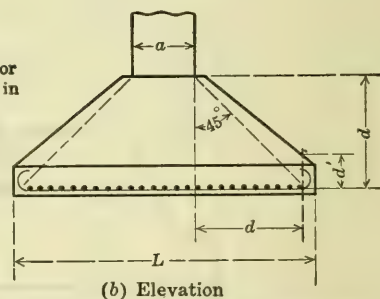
TYPICAL SLOPED REINFORCED CONCRETE FOOTING ON SOIL.
